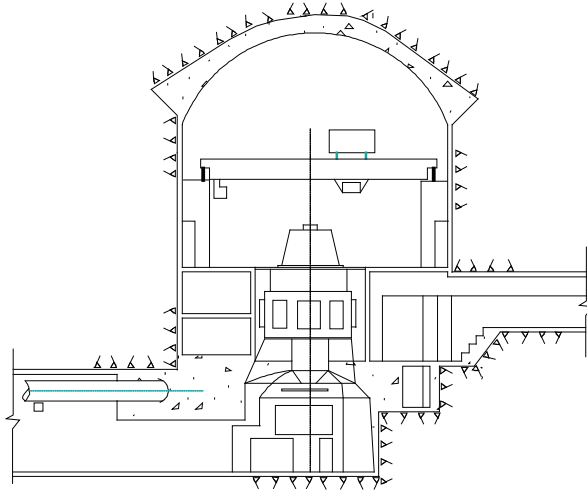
Underground Powerhouse – typical cross-section.
